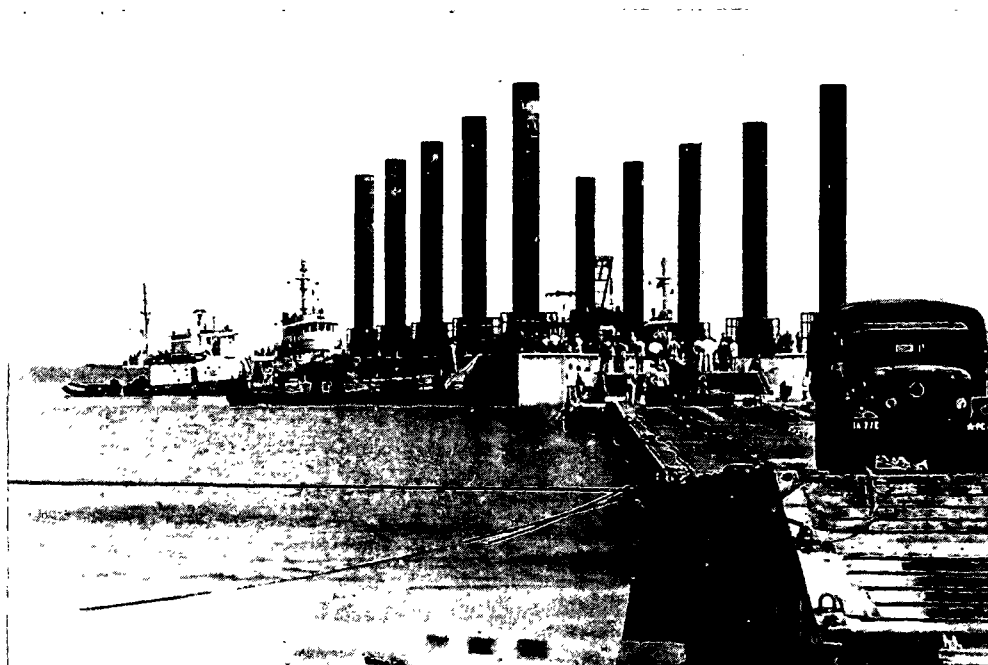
Semipermanent pier. As soon as possible in a LOTS operation, conventional facilities must be developed. This jacked-up DeLong pier is joined to the beach by a floating causeway. If water depth is sufficient and a causeway is available, ships can moor directly to the pier. Otherwise barges can be shuttled to the pier for efficient offloading. Once a pier is established beyond the surfline, conventional barges can be offloaded at that point and the containers transported to the marshaling area. (US Army photograph.)
